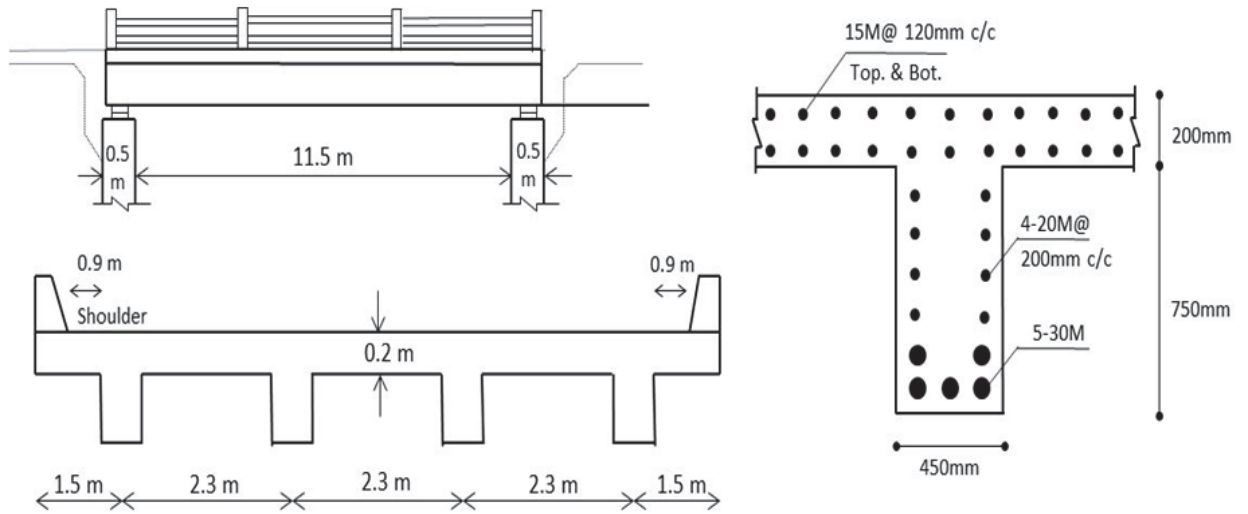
Geometry and Cross Section for the Case Study Bridge with 12 m span
